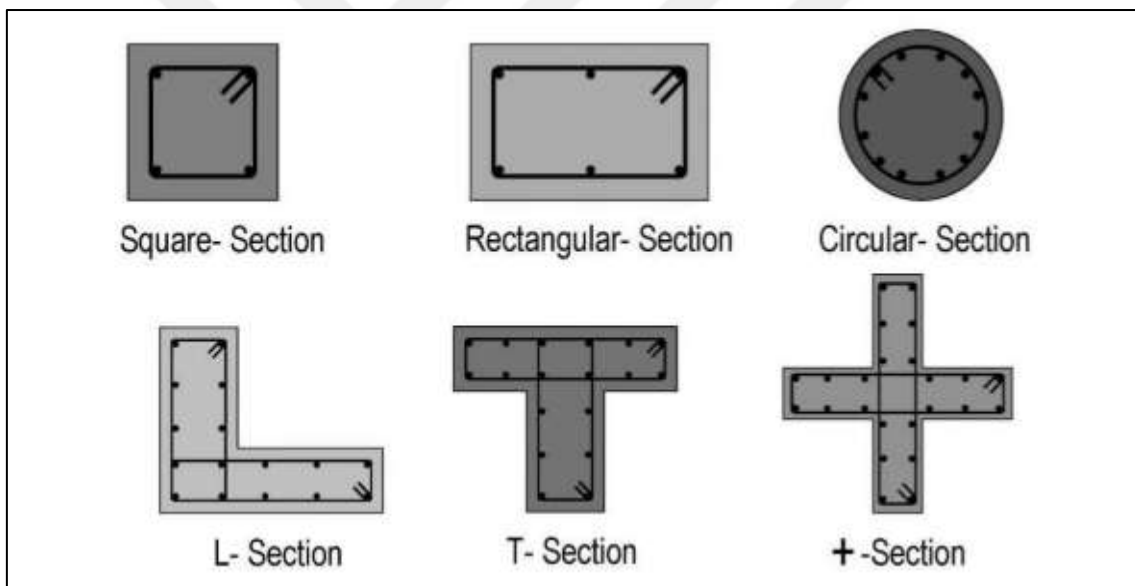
On of Column with Lateral and Longitudinal Reinforcement[10].
